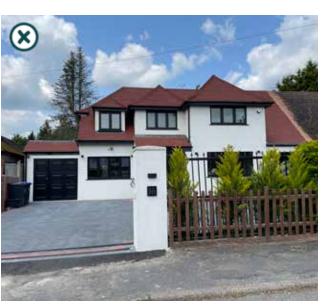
Negative example of hipped roofs. The set of hipped roofs placed uniformly in a row, adding an out-of-proportion feel to the roof and lacks interest in the roofscape.
